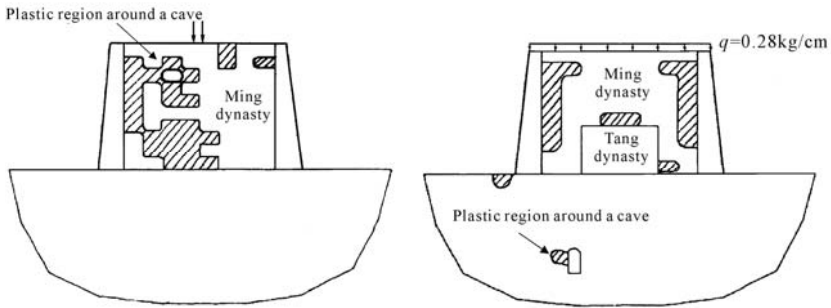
The plastic failure of city wall around a cave in the wall
